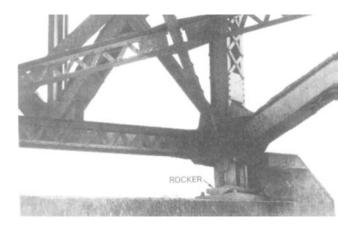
Metal bearings. (Sheet 4 of 4)
